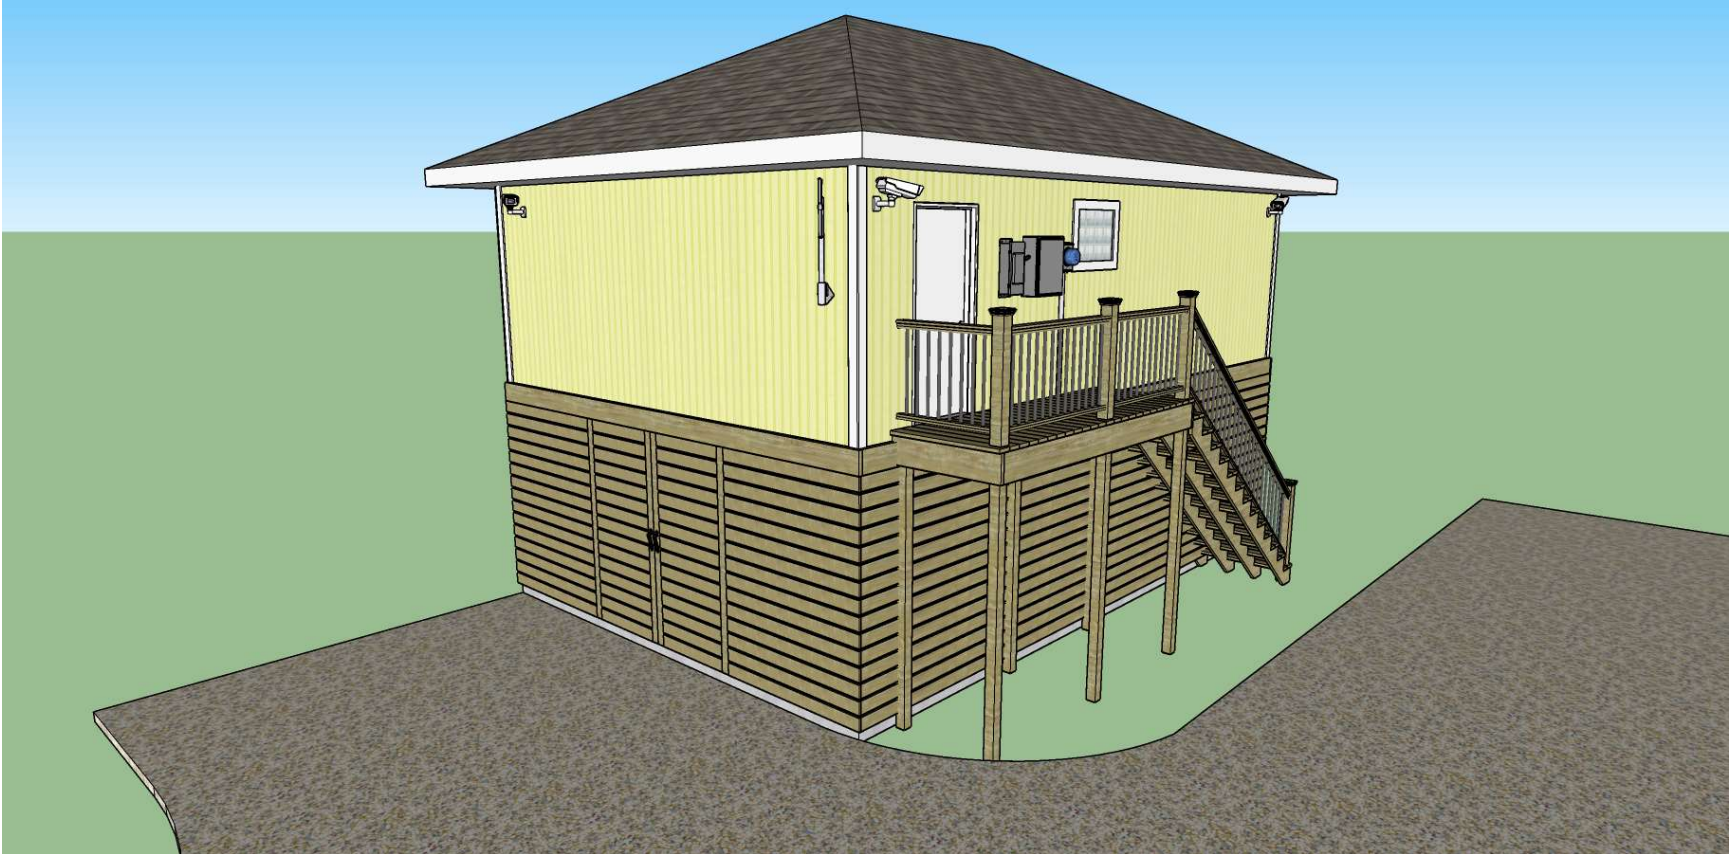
Proposed building configuration. Construction is a reinforced concrete main floor supported by steel pilings to an elevation above the 100 year-flood (approximately 8 feet above existing grade). Remainder of the building is conventional stick frame construction, with materials selected for weather resistance and reduced maintenance. Color scheme will be selected to complement the adjacent Town Hall structure.
